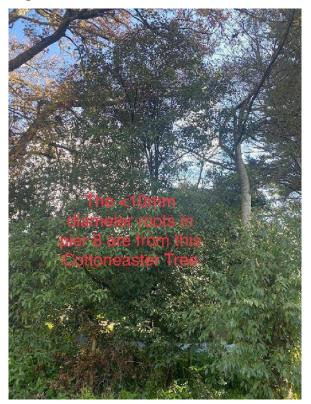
The trees that have their roots in the location of pier 8 and 9.
